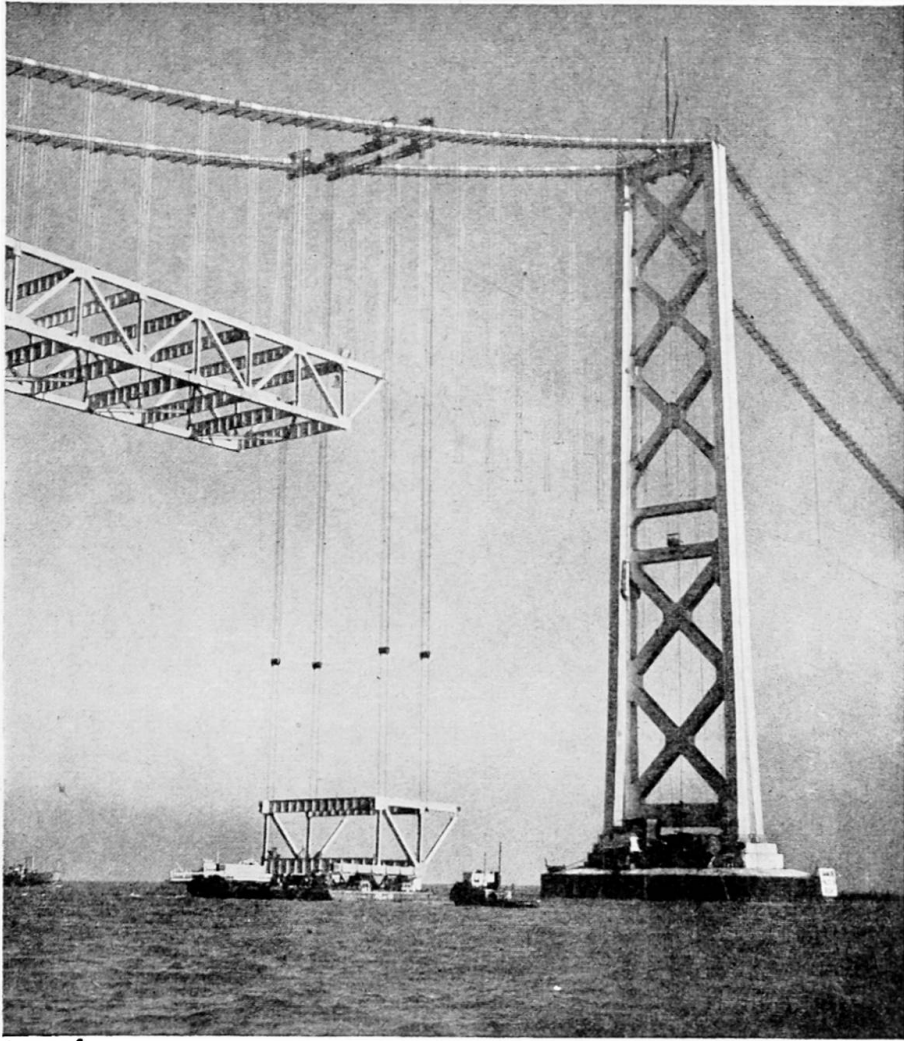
San-Francisco-Oakland Bay Bridge. Erection of heavy units of deck steelwork
